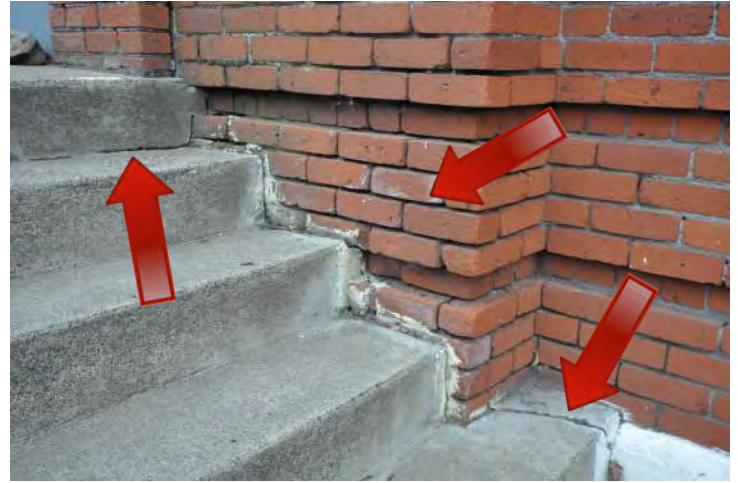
Masonry wall deterioration at the west stairs at the north main entry to the Library. Similar to the east, mortar deterioration is severe and the concrete appears to be tothing into the masonry coursing. It also appears that there may be some settlement of the stair which is causing additional stresses in both the concrete stair and masonry wall system. On this stair that appears to be resulting in a crack in the concrete at the top riser and potentially also excessive loads on the brick at the same level. At the bottom step, the concrete is cracking adjacent to the wall where it overlaps the concrete foundation. It also appears that some parts of the brick at the edge of the stair have become exposed.
